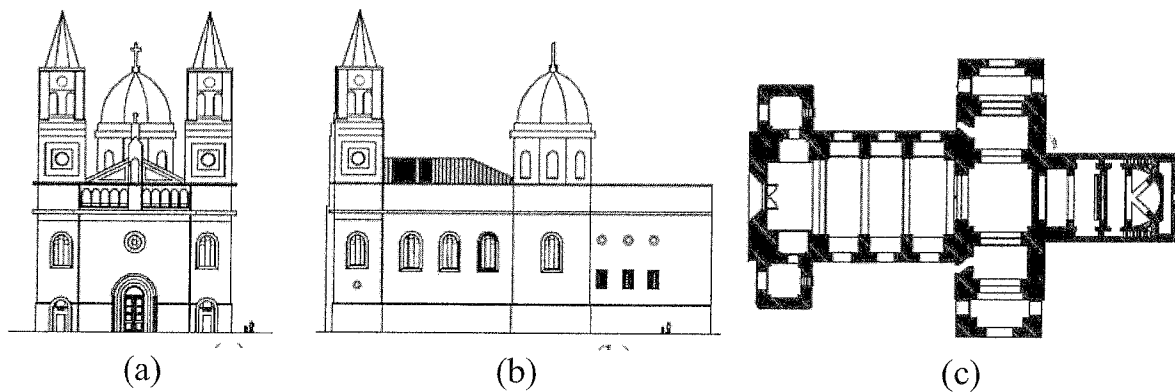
S. Torcato church: (a) main façade; (b) lateral view; (c) plan
